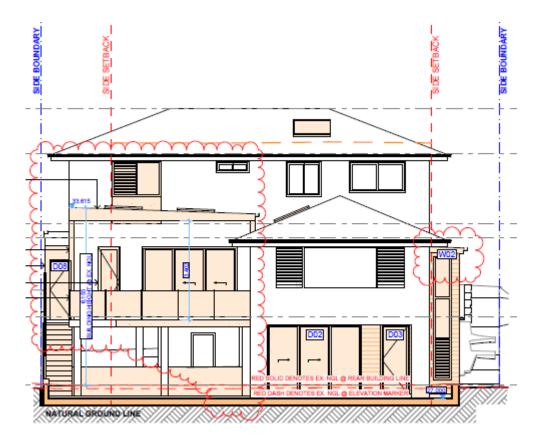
Extract from the Modification Plans (MOD07) showing the rear elevation and changes to the roof form at ground floor level (including retention of roof above living room).
